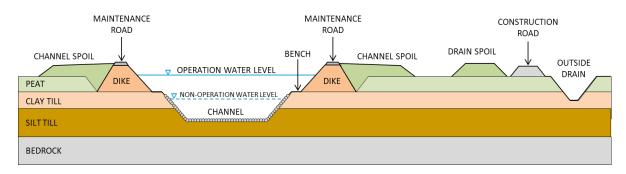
Typical Cross Section of the Lake St. Martin Outlet Channel
